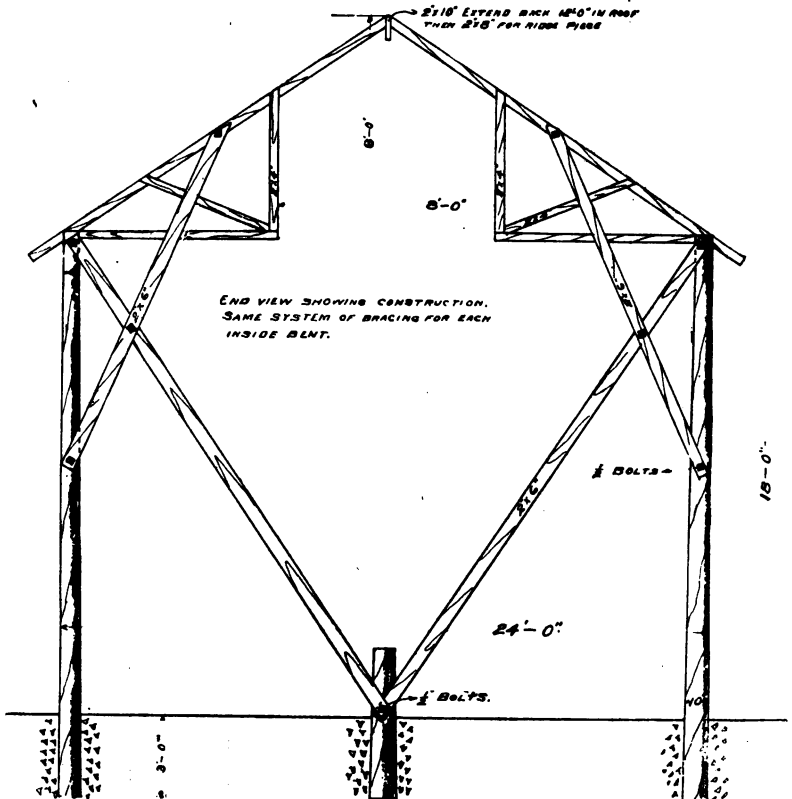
Plan of construction of end section of hay barn and general plan of bracing for middle sections.—[Courtesy Kansas Experiment Station.]
